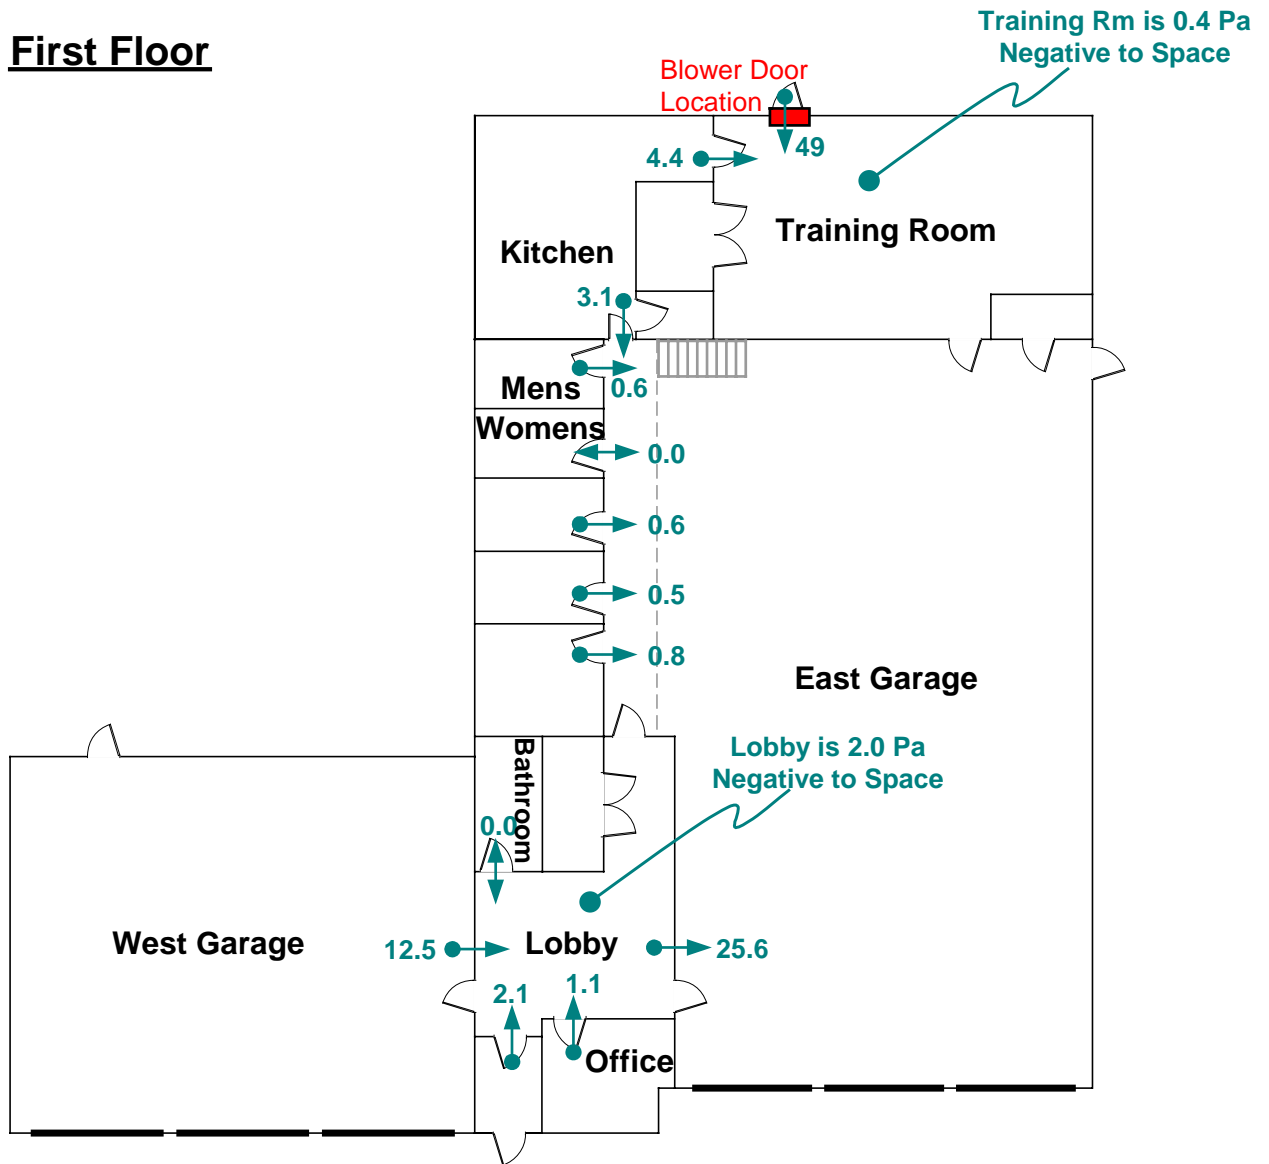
First Floor Room-to-Corridor Pressures with Building Depressurized to 49 Pa
